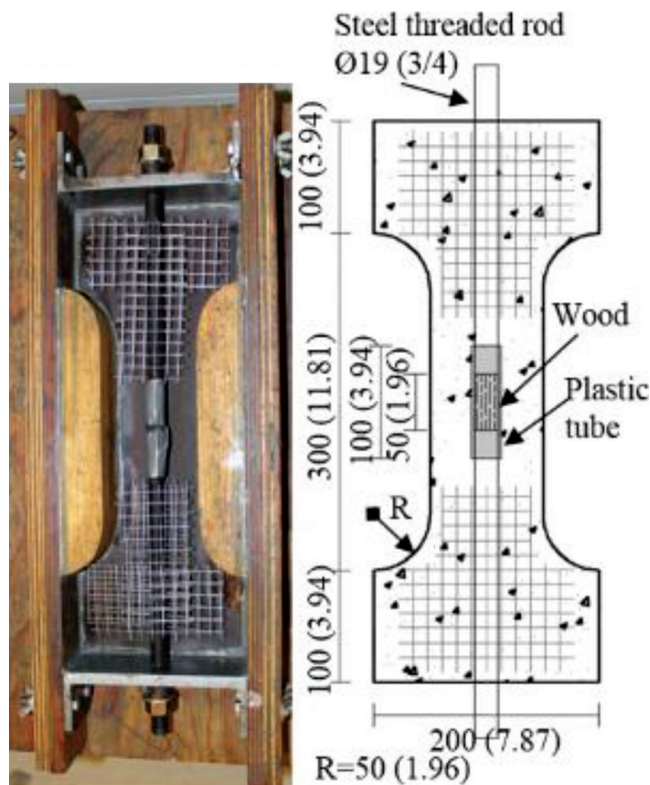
Direct tension specimen; thickness equal to 70 mm (2.76 in.); dimensions in mm (in.).
